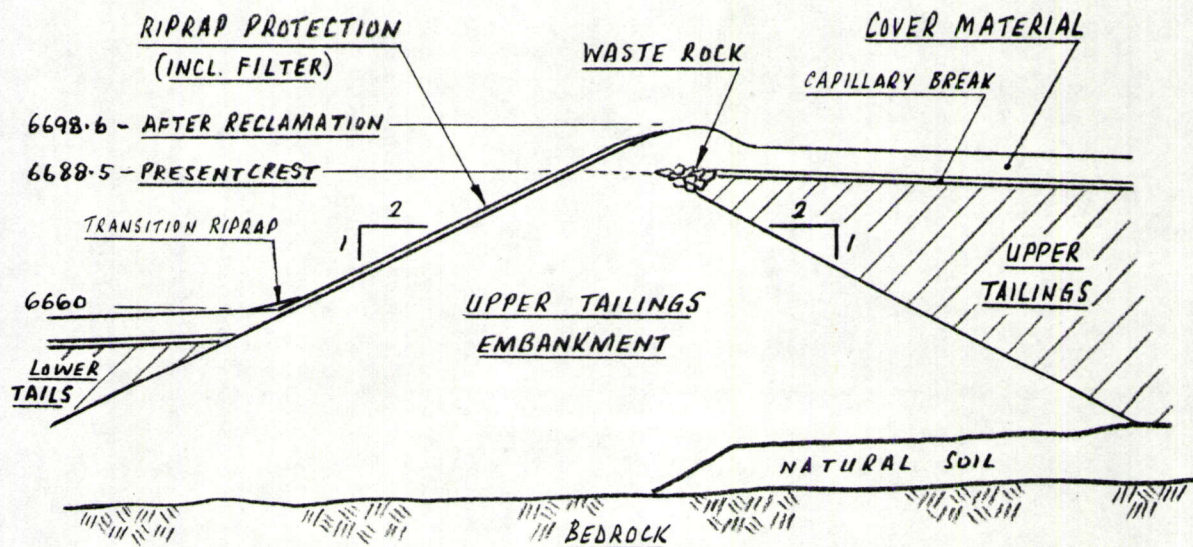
CROSS SECTION OF UPPER DAM AT RECLAMATION
